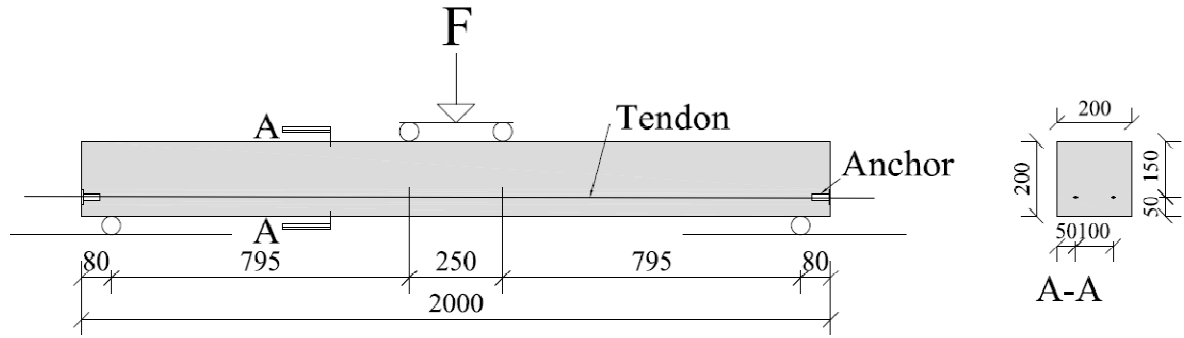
Schematic drawings of bending test setup and beam cross section
